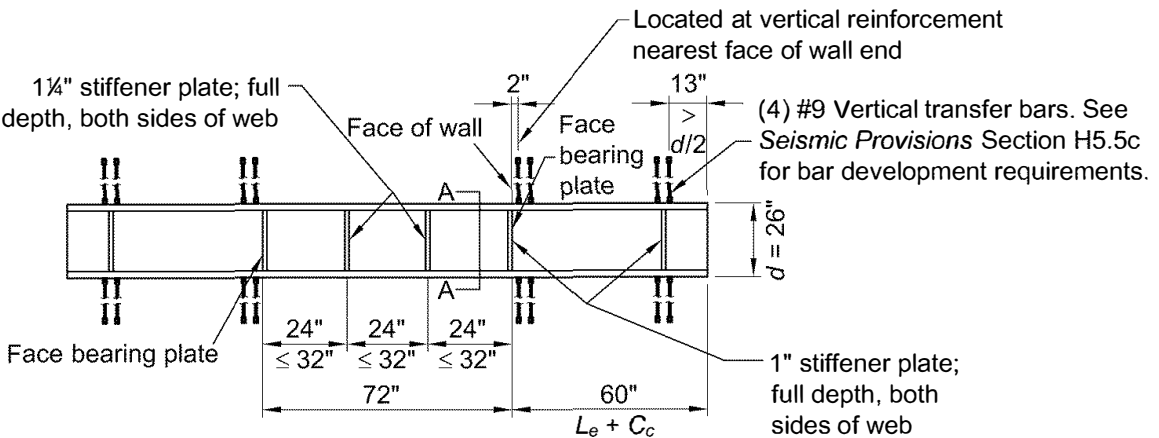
Steel coupling beam detail for Example 7.5.3.
